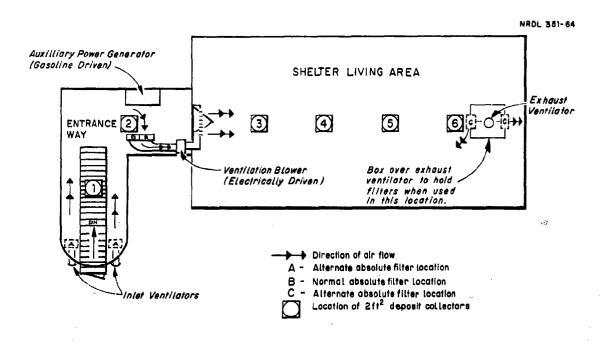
Schematic Plan of Prototype Shelter: Ventilation System and Aerosol Ingress Sample Collectors
